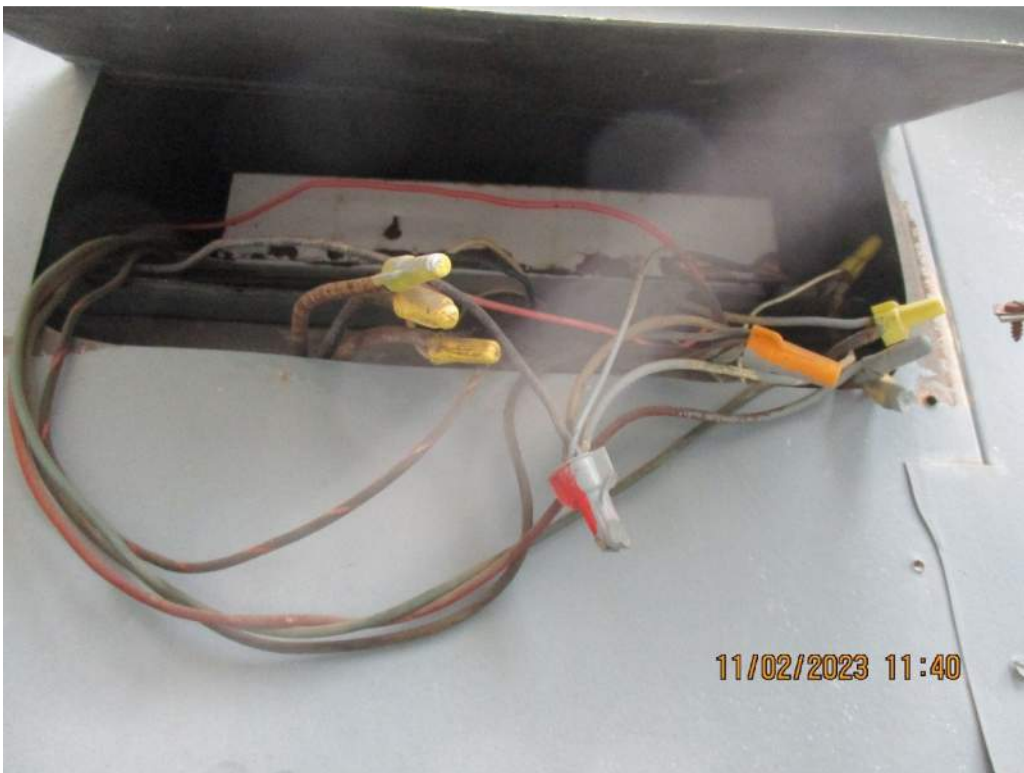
Electrical Wiring Within Interior Paneling Access Locations - Typical
